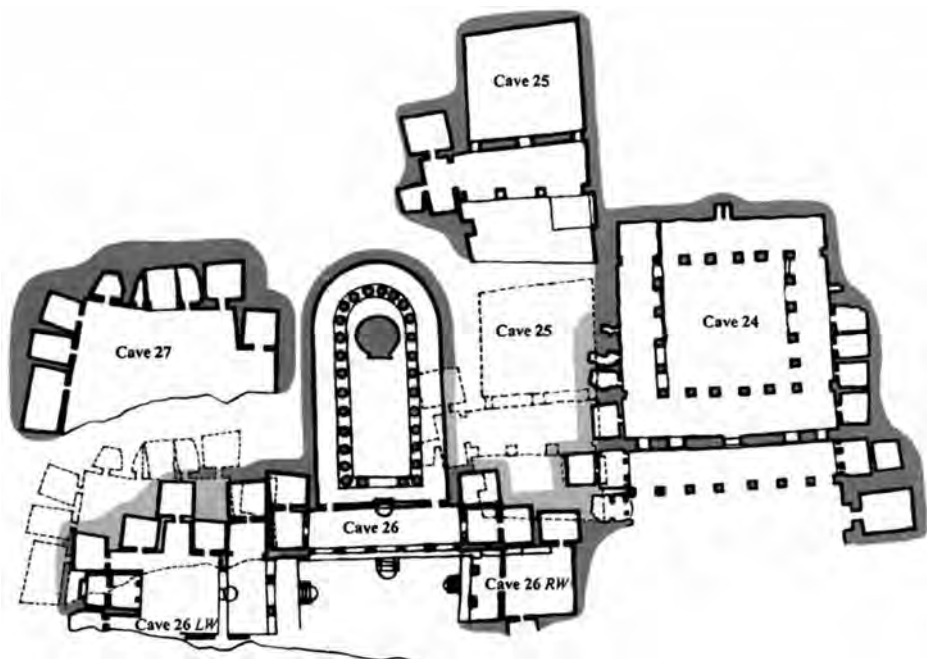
Ajanta Cave 26 complex:(Yazdani IV) with conjectural reconstruction: original plan (WS)
